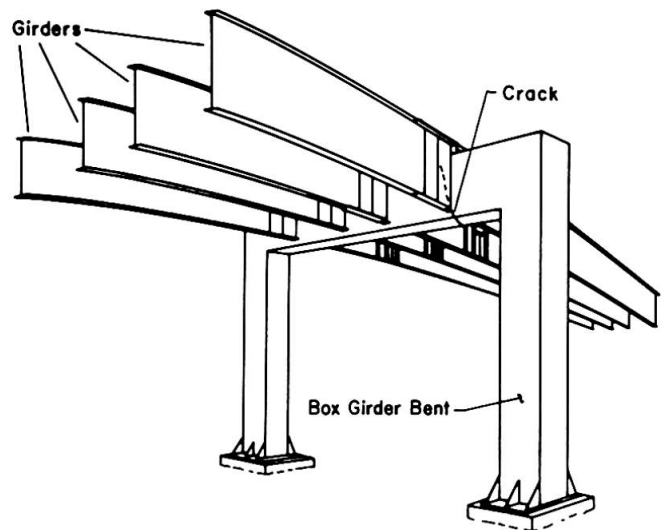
Schematic Showing Box-Shaped Bent and Girders with Crack Location
